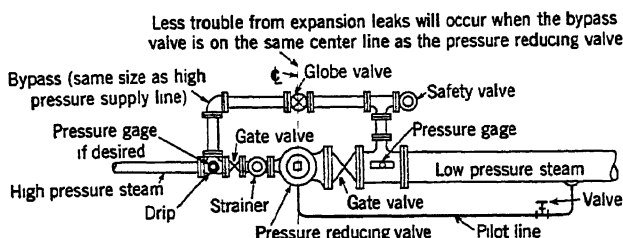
TYPICAL PRESSURE-REDUCING VALVE INSTALLATION
